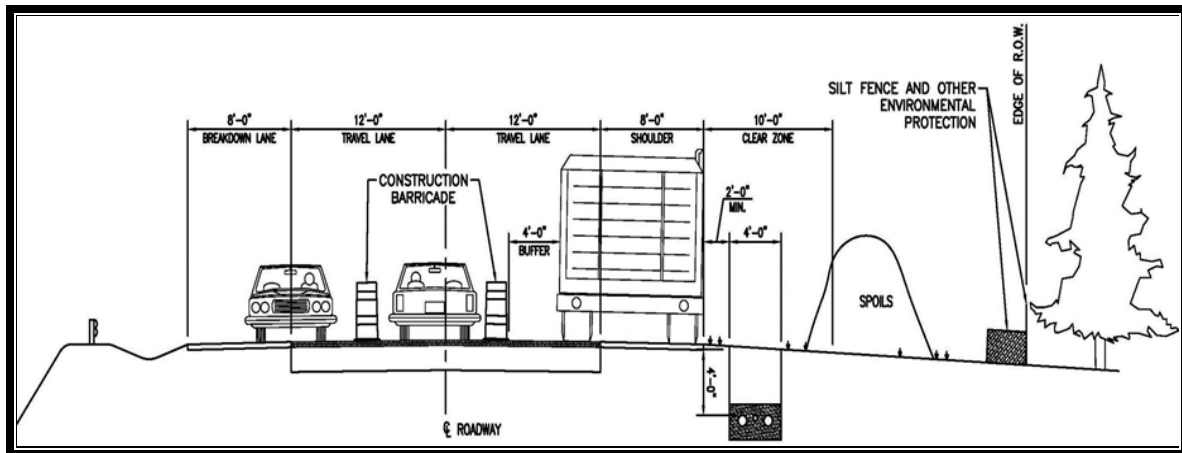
EXAMPLE TERRESTRIAL HVDC TRANSMISSION CABLE CROSS-SECTION
